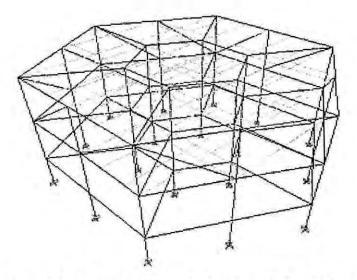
3D view of the FE model of a typical cyclone shelter built by Grameen Bank (with bracing)
